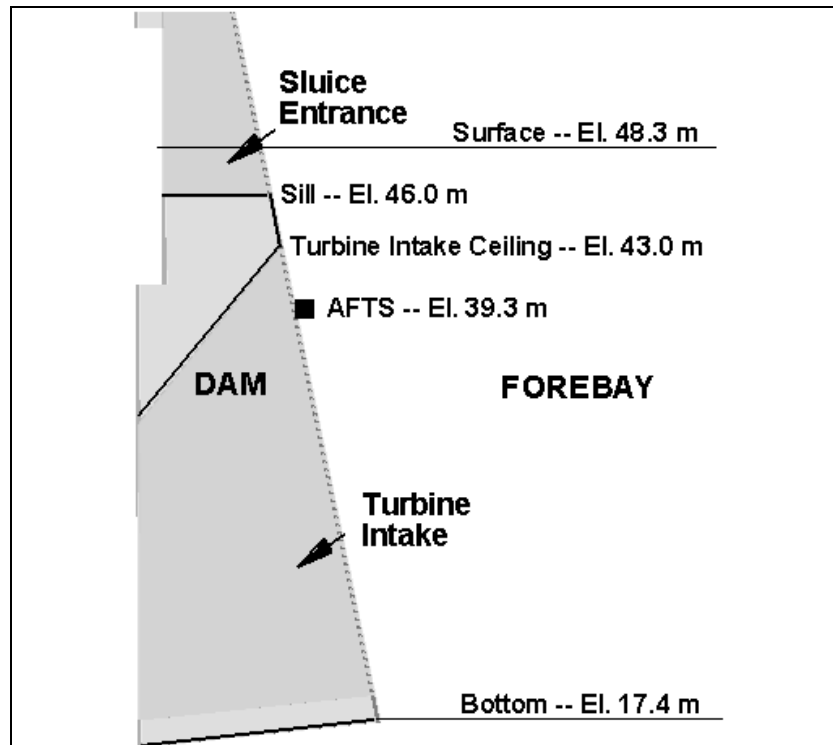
Sectional view of The Dalles Dam powerhouse showing sluiceway channel, sill, turbine intake, and location of the active fish tracking sonar (AFTS).
